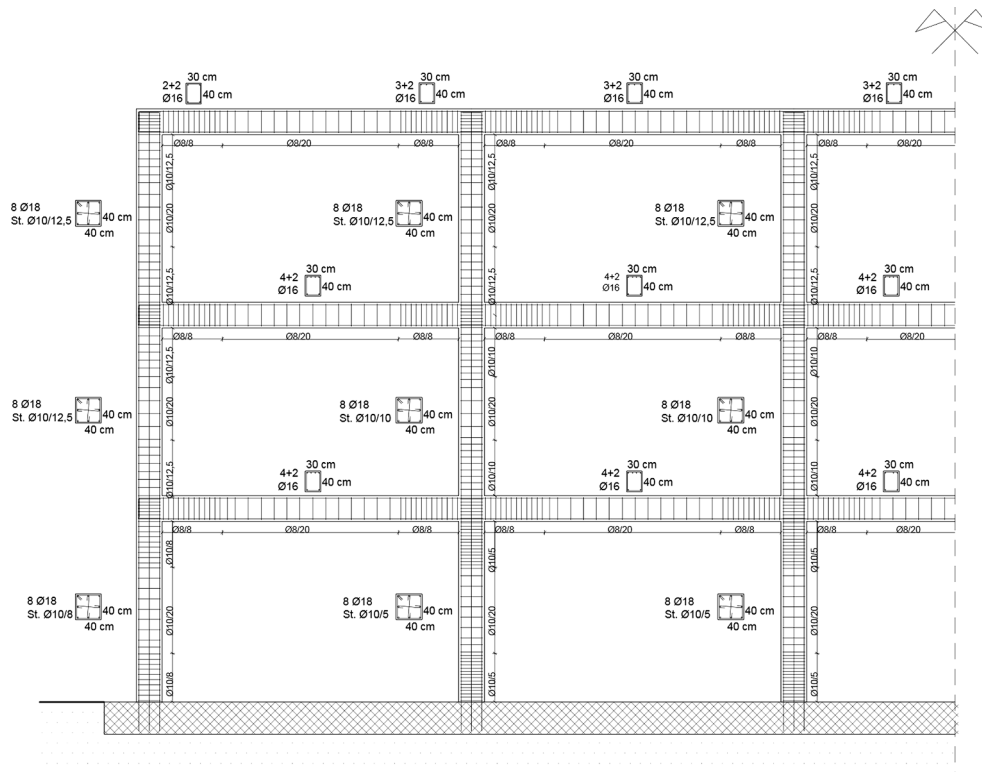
3-story RC frame archetype: reinforcement arrangement.
